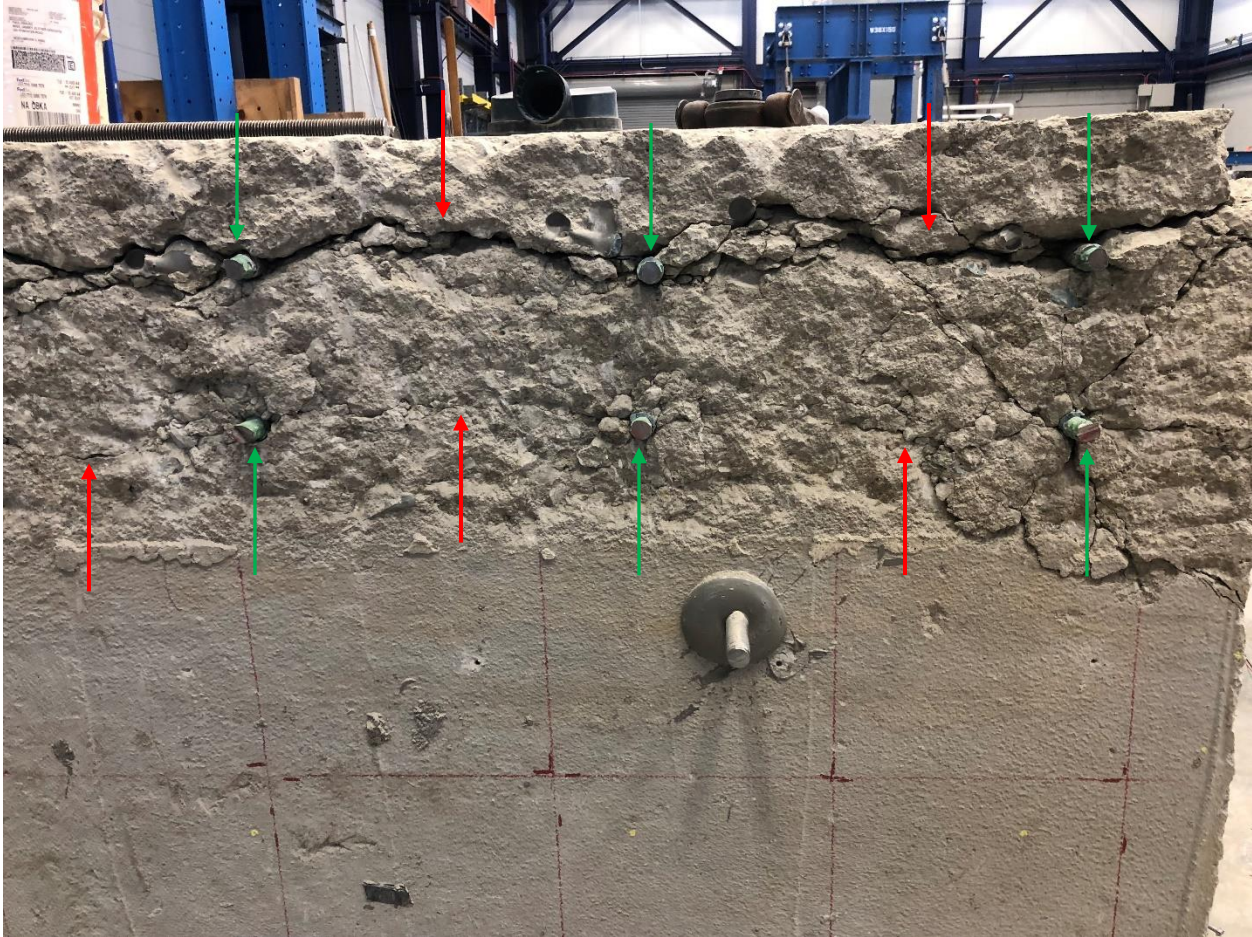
Test Sample B2. Green arrows point to the reinforcement anchors. Red arrows point to cracks between a row of anchors.
